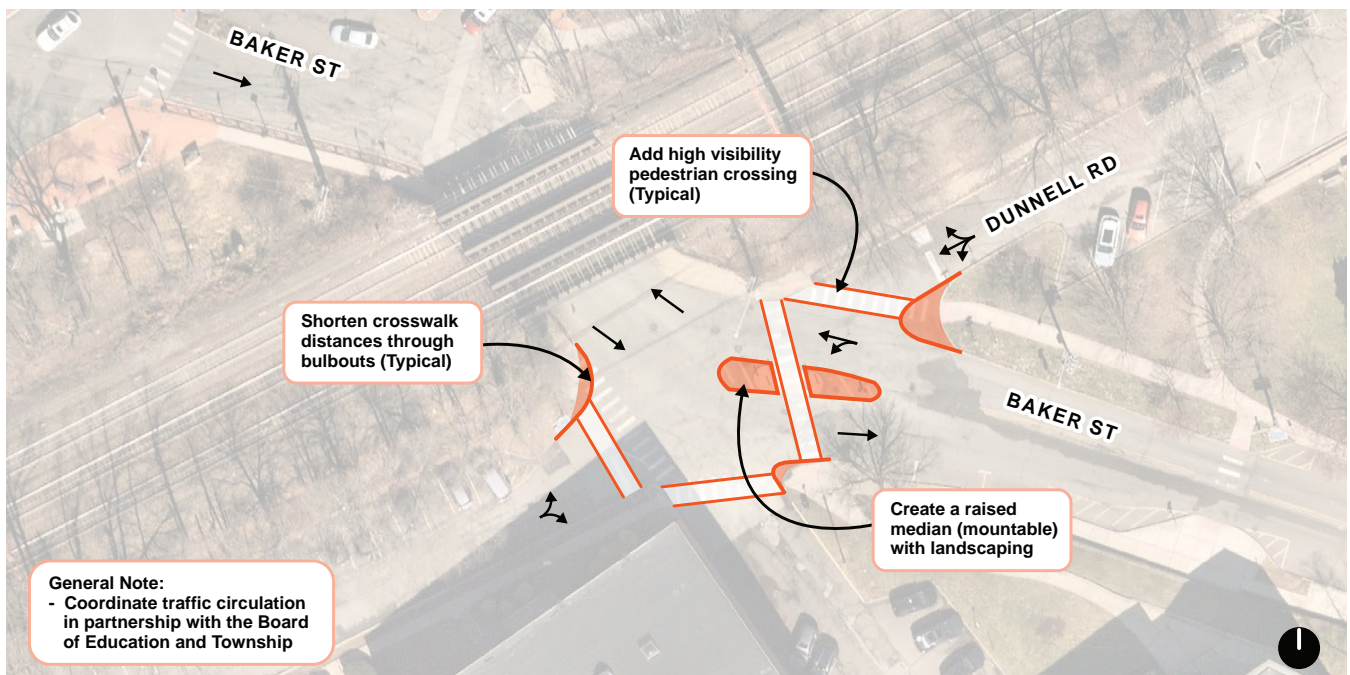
Conceptual Plan for the Intersection at Baker Street and Dunnell Road
